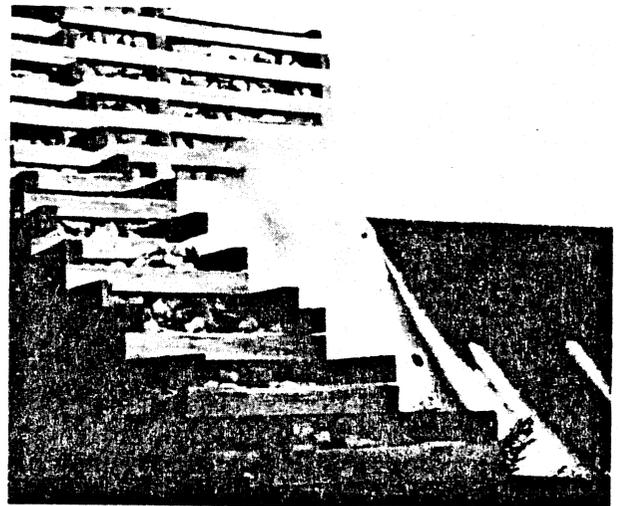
One segment of dam after repairs to timbering, replacement of rock fill, and placement of gunite facing
